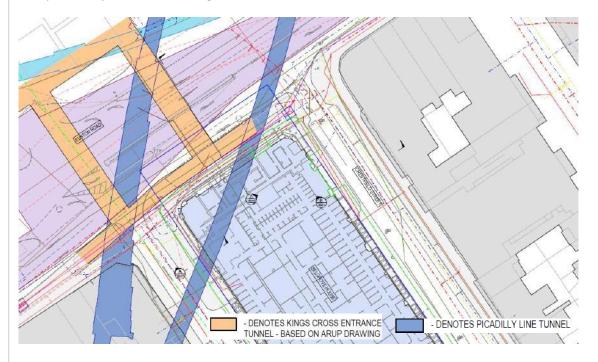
Extract of site constraint plan indicating location of Piccadilly Line tunnels and Kings Cross station entrance tunnels
